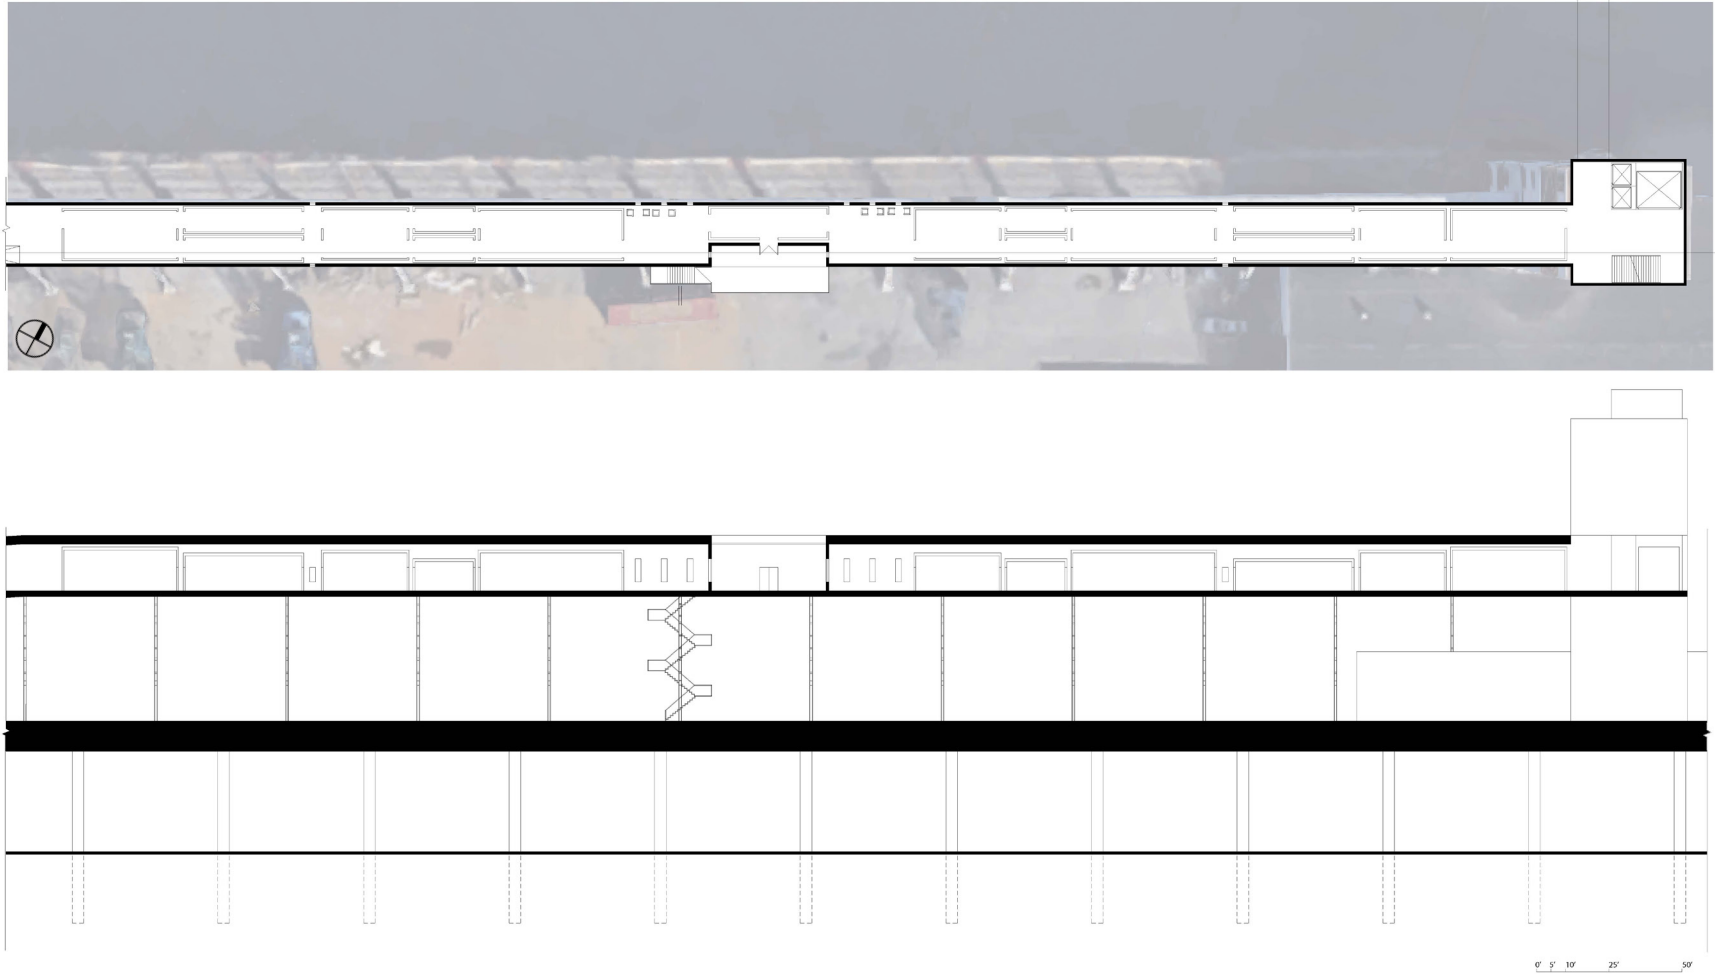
Plan and section of the Pier Conveyor gallery (base from Google Earth 2020)
